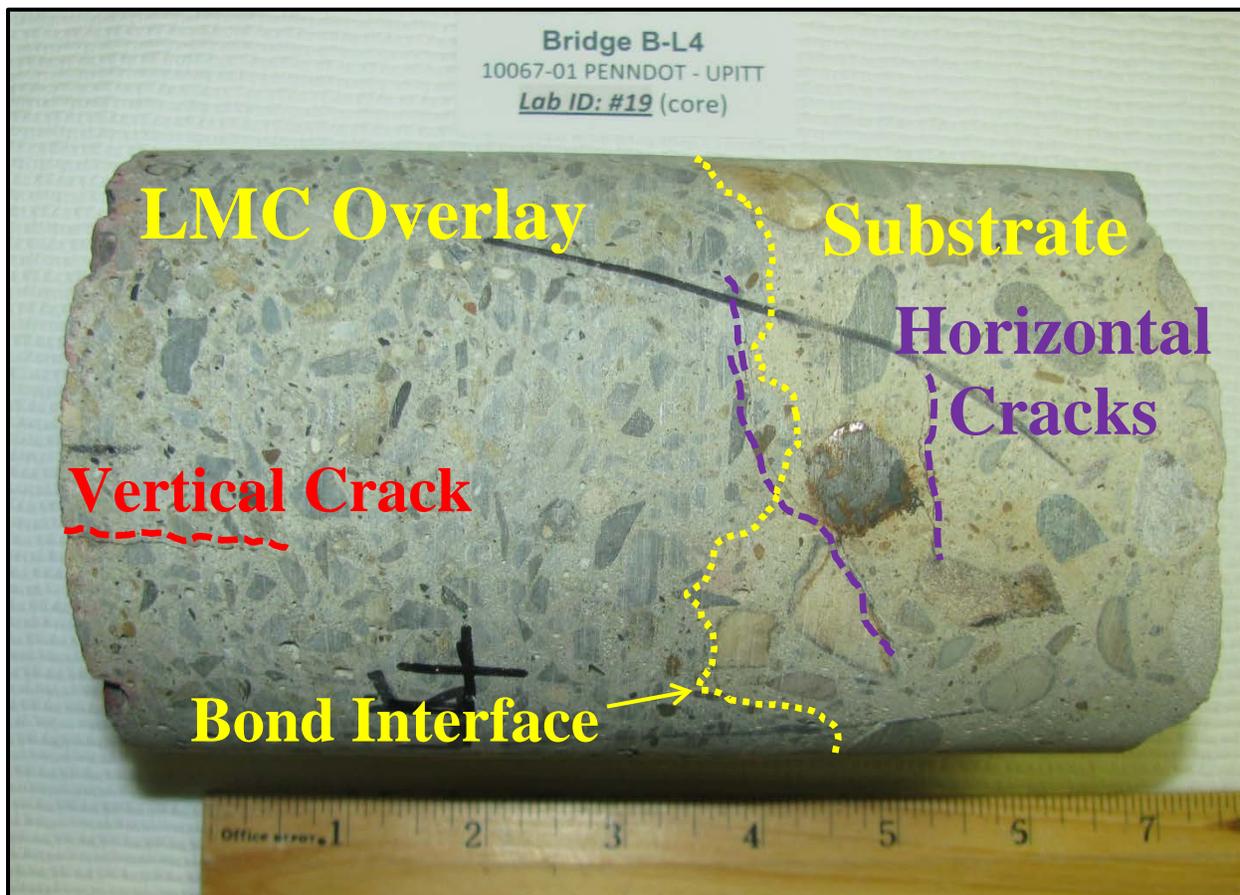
Core with vertical crack and horizontal cracking due to reinforcement corrosion.
